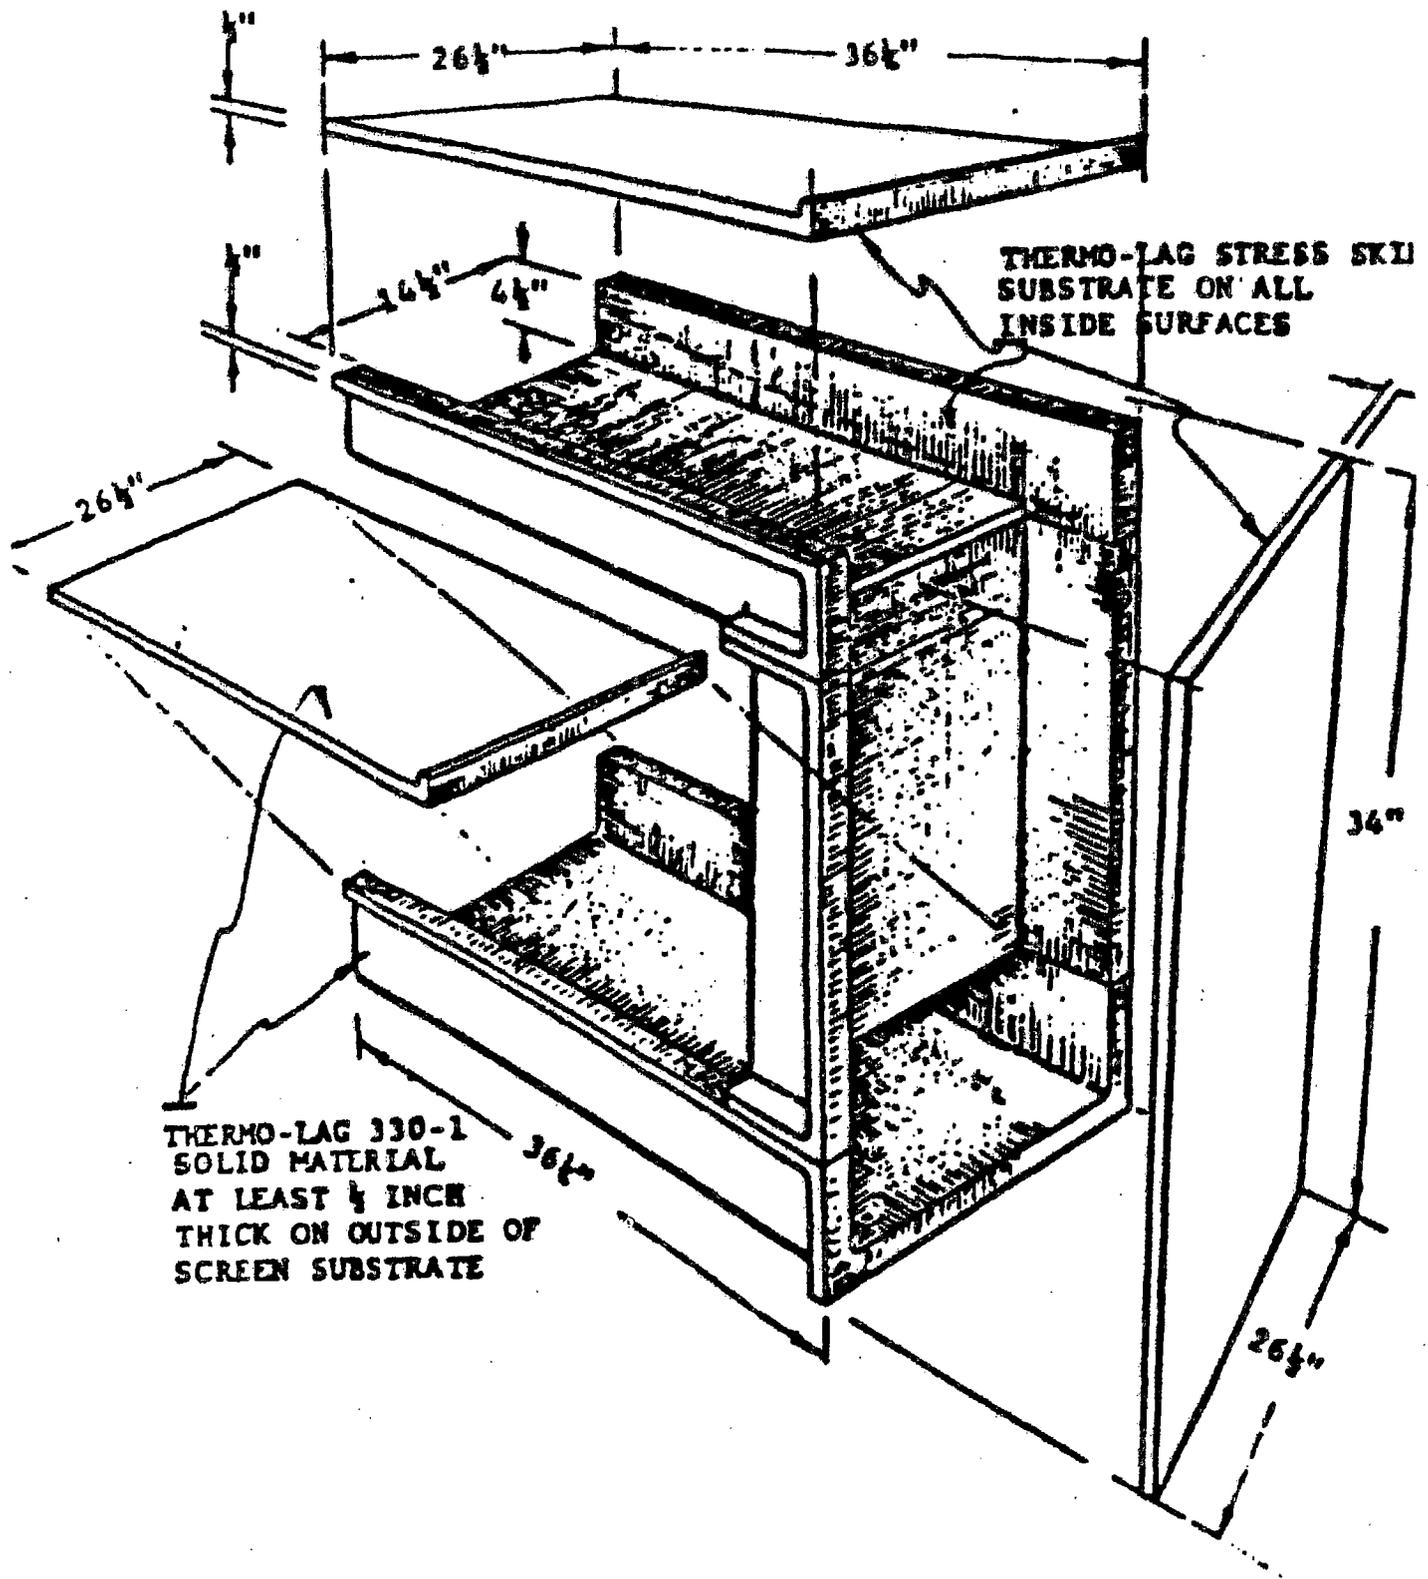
EXPLODED VIEW OF SUBLIMING COATING ENVELOPE SYSTEM
